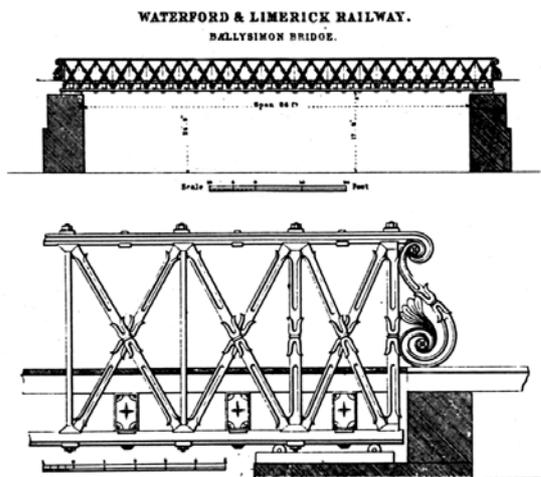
Combined cast and wrought iron Howe truss with 26.2 m (86 ft) span, Waterford & Limerick Railway, Ireland, c.1840s. (Sutherland²)
